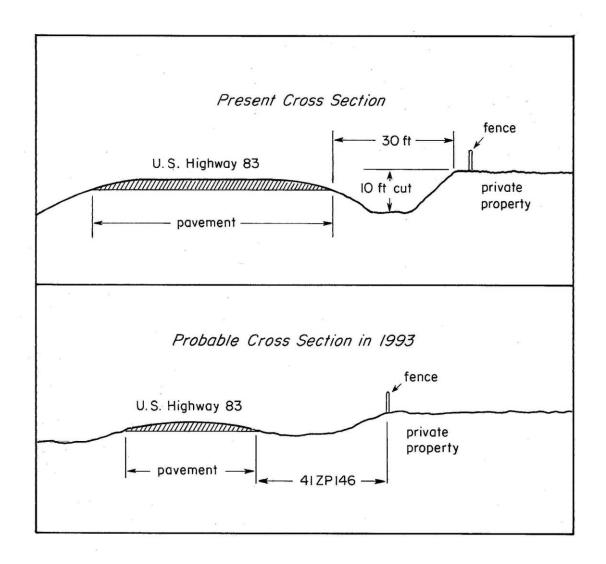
Cross-Section of Right-of-Way at Site 41ZP146
